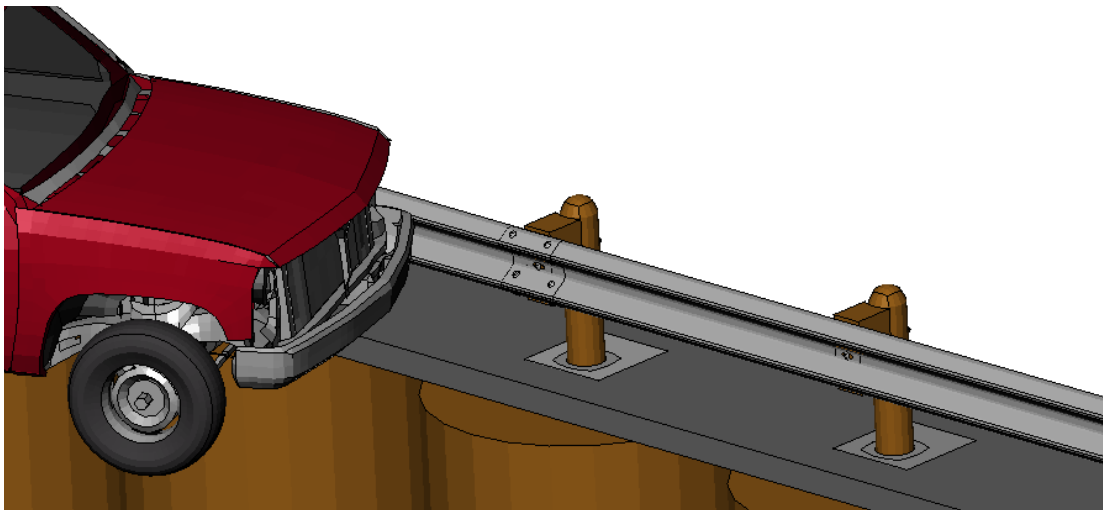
Finite Element Model of Wood Post Guardrail System Encased in Concrete Mow Strip with Grout-filled Leave-outs.
